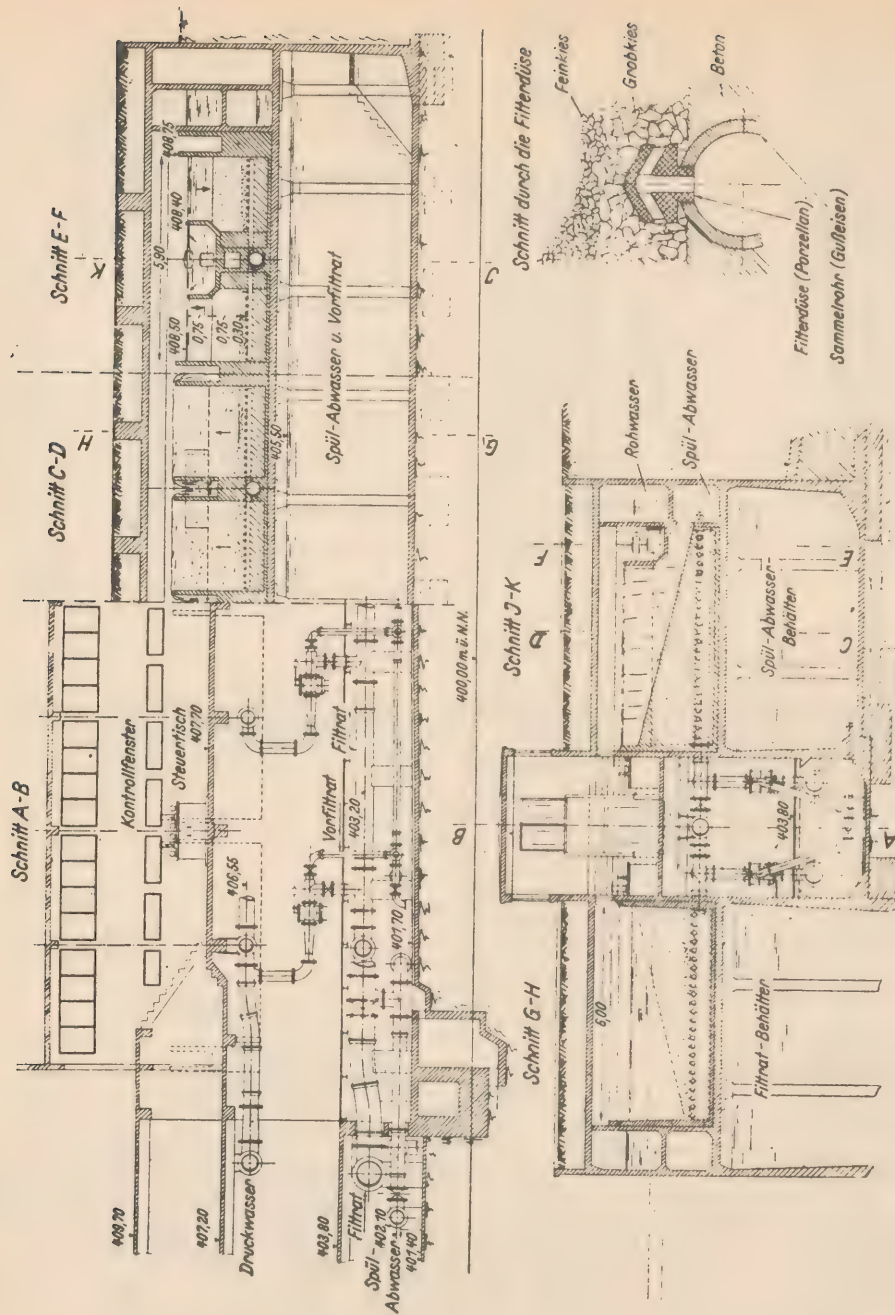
b, sections through de-chlorinating filter at Gallenklinge plant - Stuttgart.
